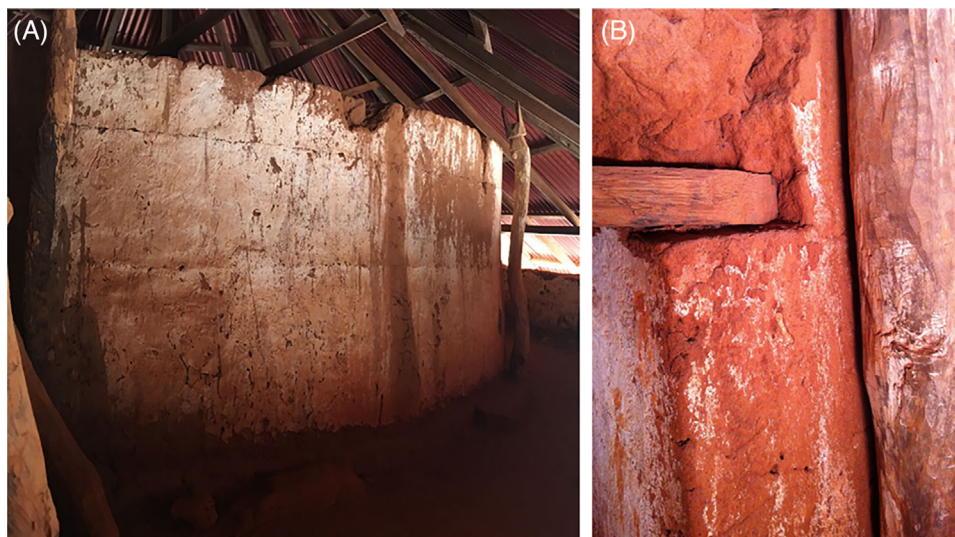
Illustration of the wall of King Ghezo's tomb. Panel A shows a general view of the cenotaph wall. Panel B shows specific detail of the red wall buttressed by a wood beam. Copyright: Philippe Charlier.
